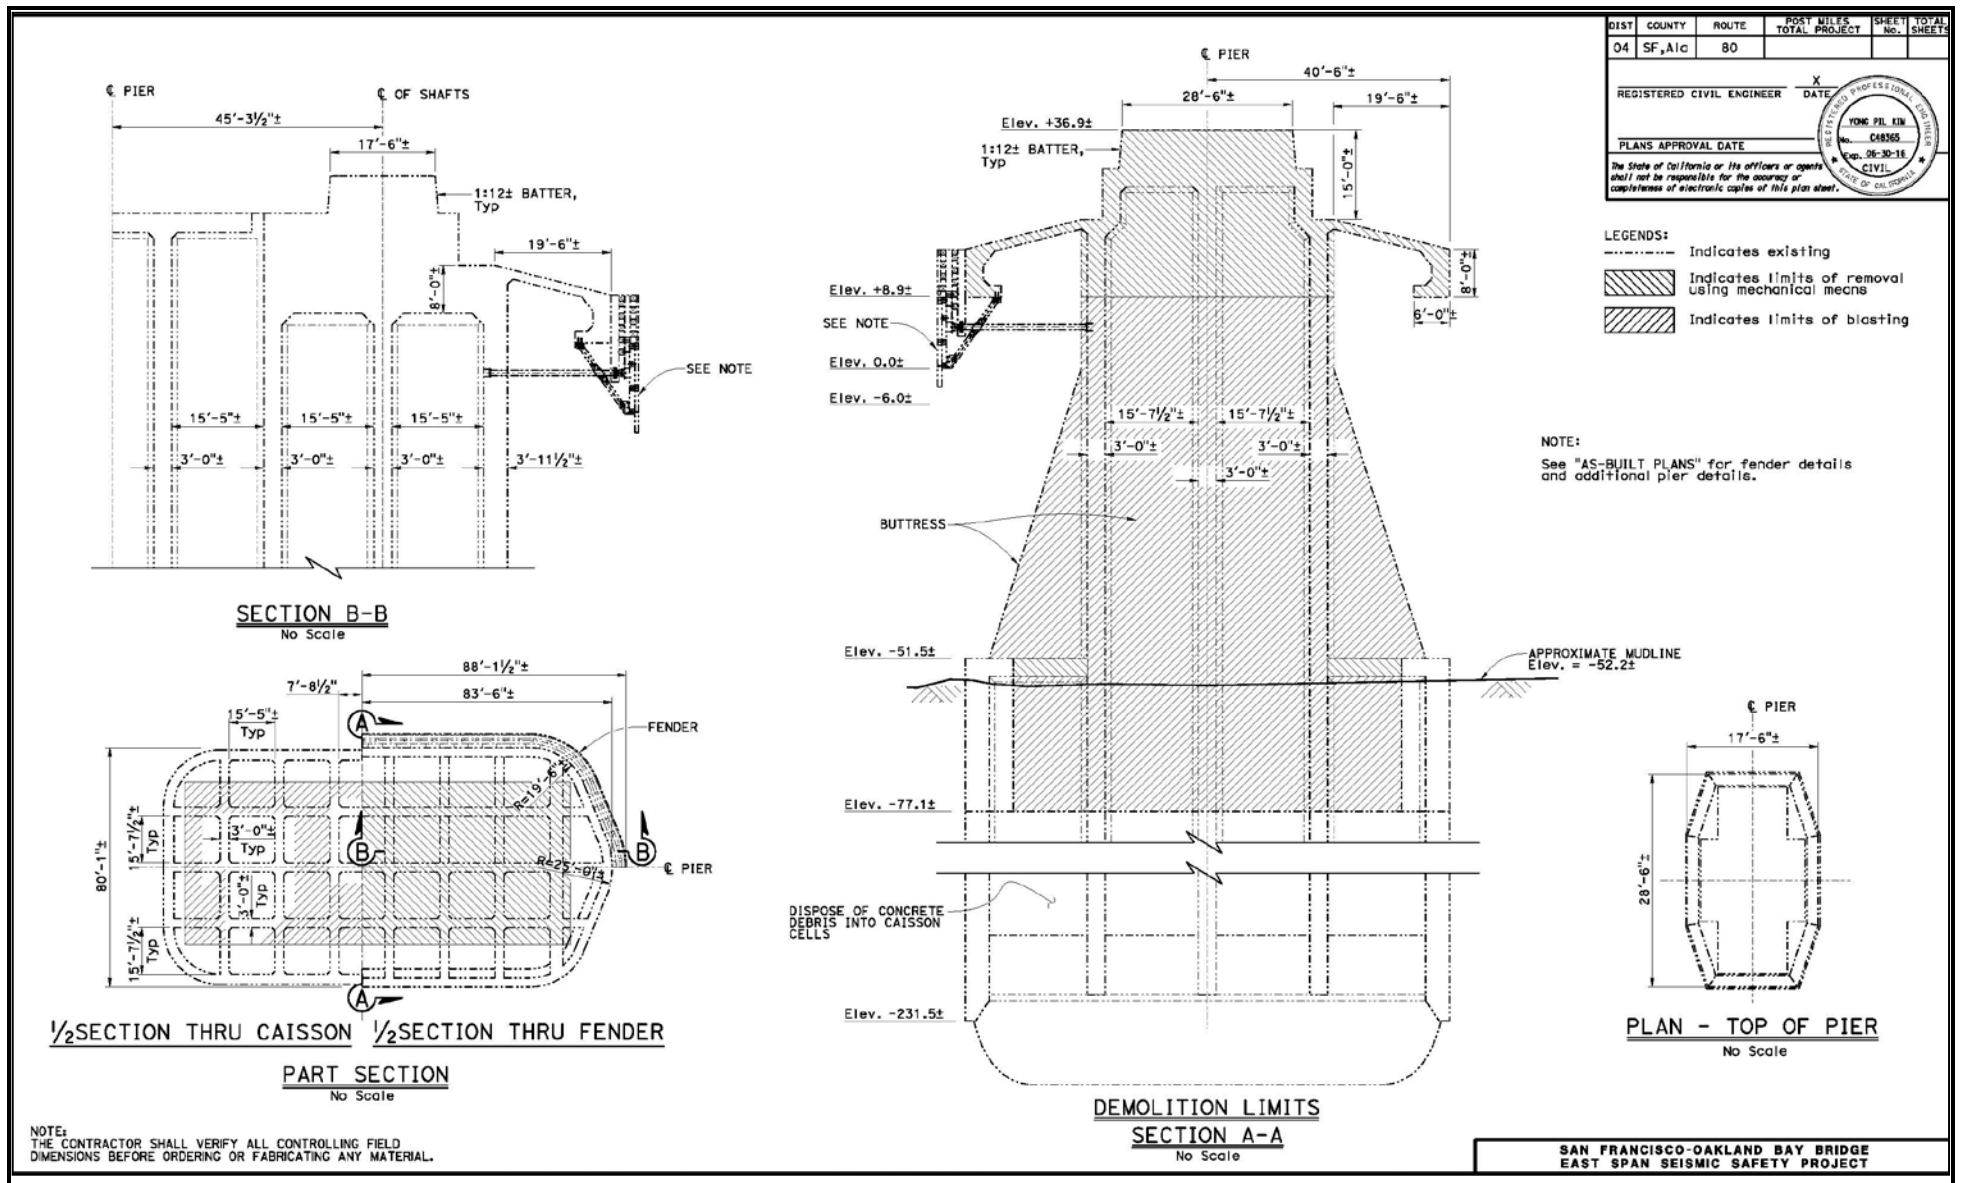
Draft plan sheets of Pier E3 caisson showing elevations, dimensions and limits of removal.
